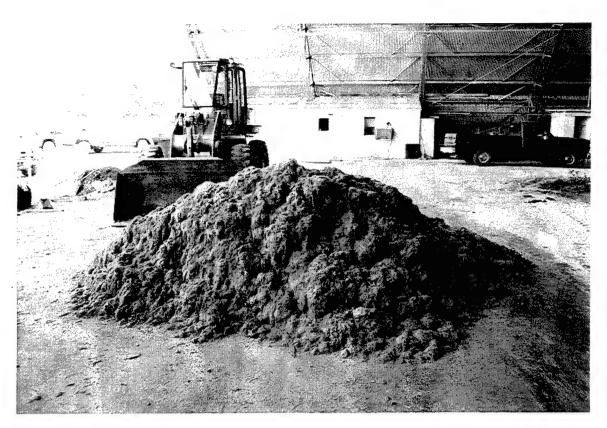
Mixture of sand-fiber and Road Oyl prior to installation
